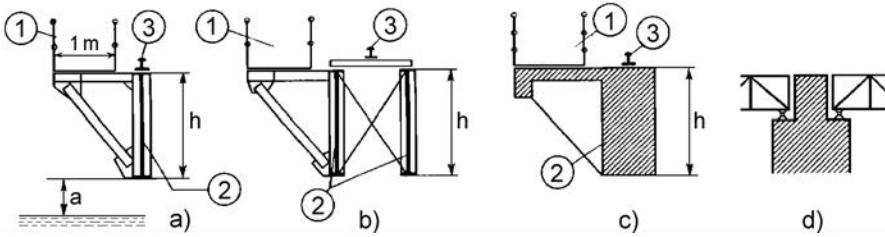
Service bridges. (1) Steel service bridge; (2) crane girder; (3) rail.
